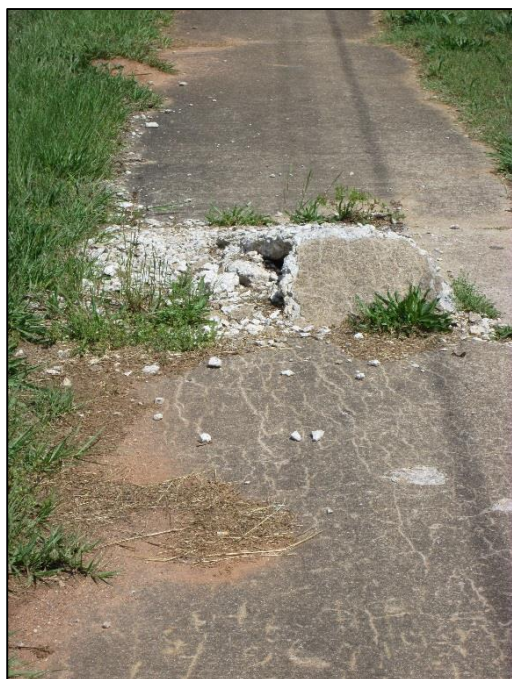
DAMAGED SIDEWALK ALONG THE CORRIDOR.
